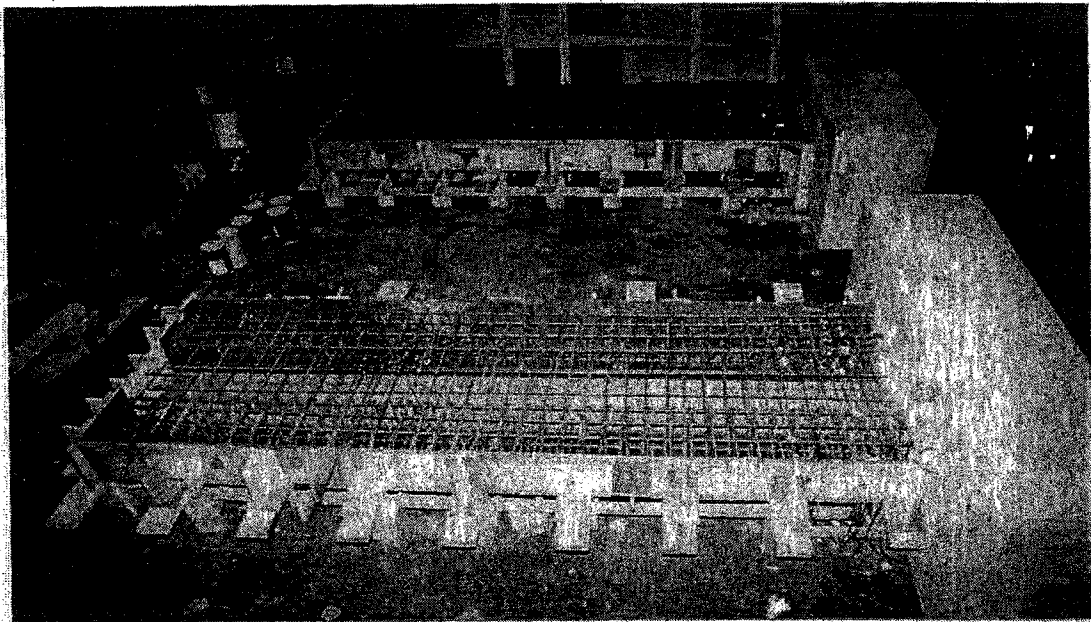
Cages of wall W-1 and W-2, ready for concreting
